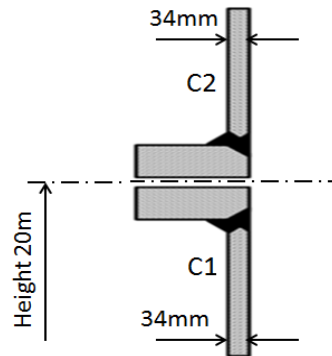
Dimensioning of cans adjacent to bottom flange
